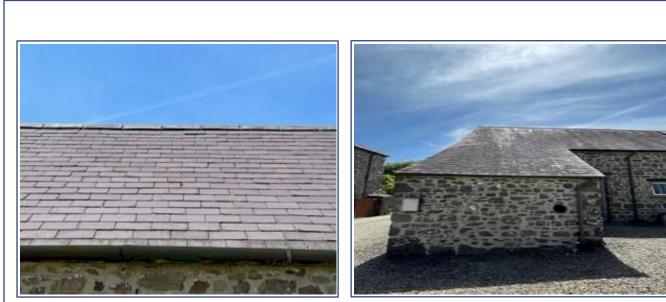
The Byre Front (South Elevation) showing the slate roof tiles.
